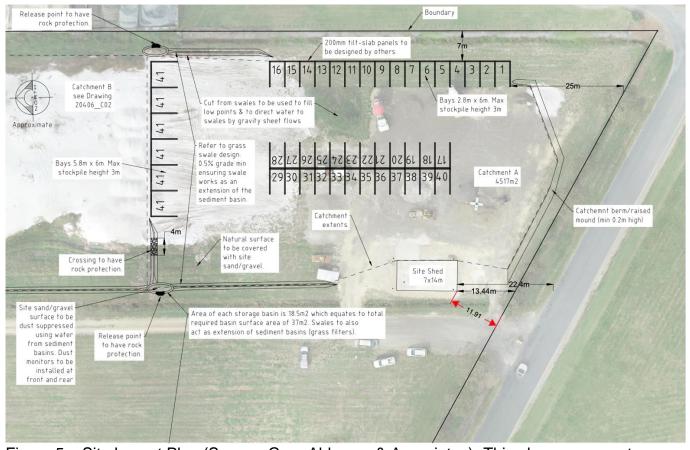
Site Layout Plan (Source: Greg Alderson & Associates) -This plan covers part of the site – refer to Figure 1 for the aerial photograph which shows the extent of the site
